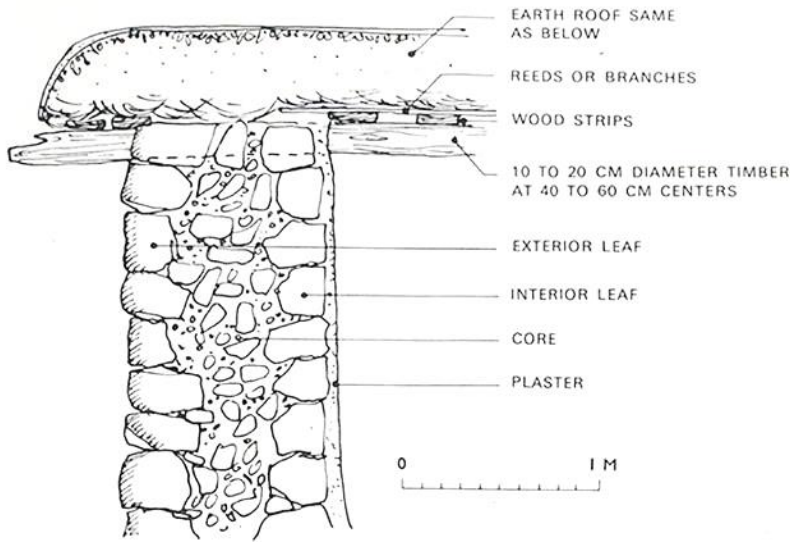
Detailed wall sections and construction method with an example of a simple dwelling in the Bekaa valley. Source: Friedrich Ragette (1974)
